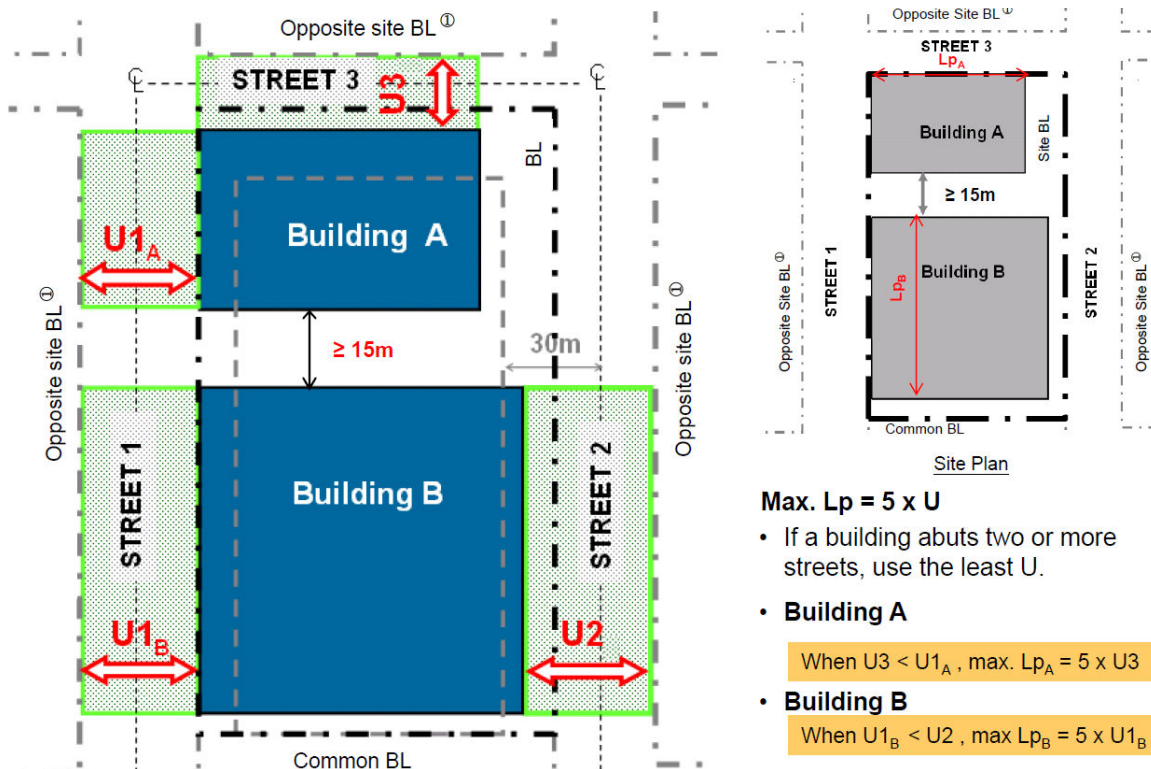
Defining the mean width of street canyon (U) and the maximum permissible continuous projected façade length (L_p)
